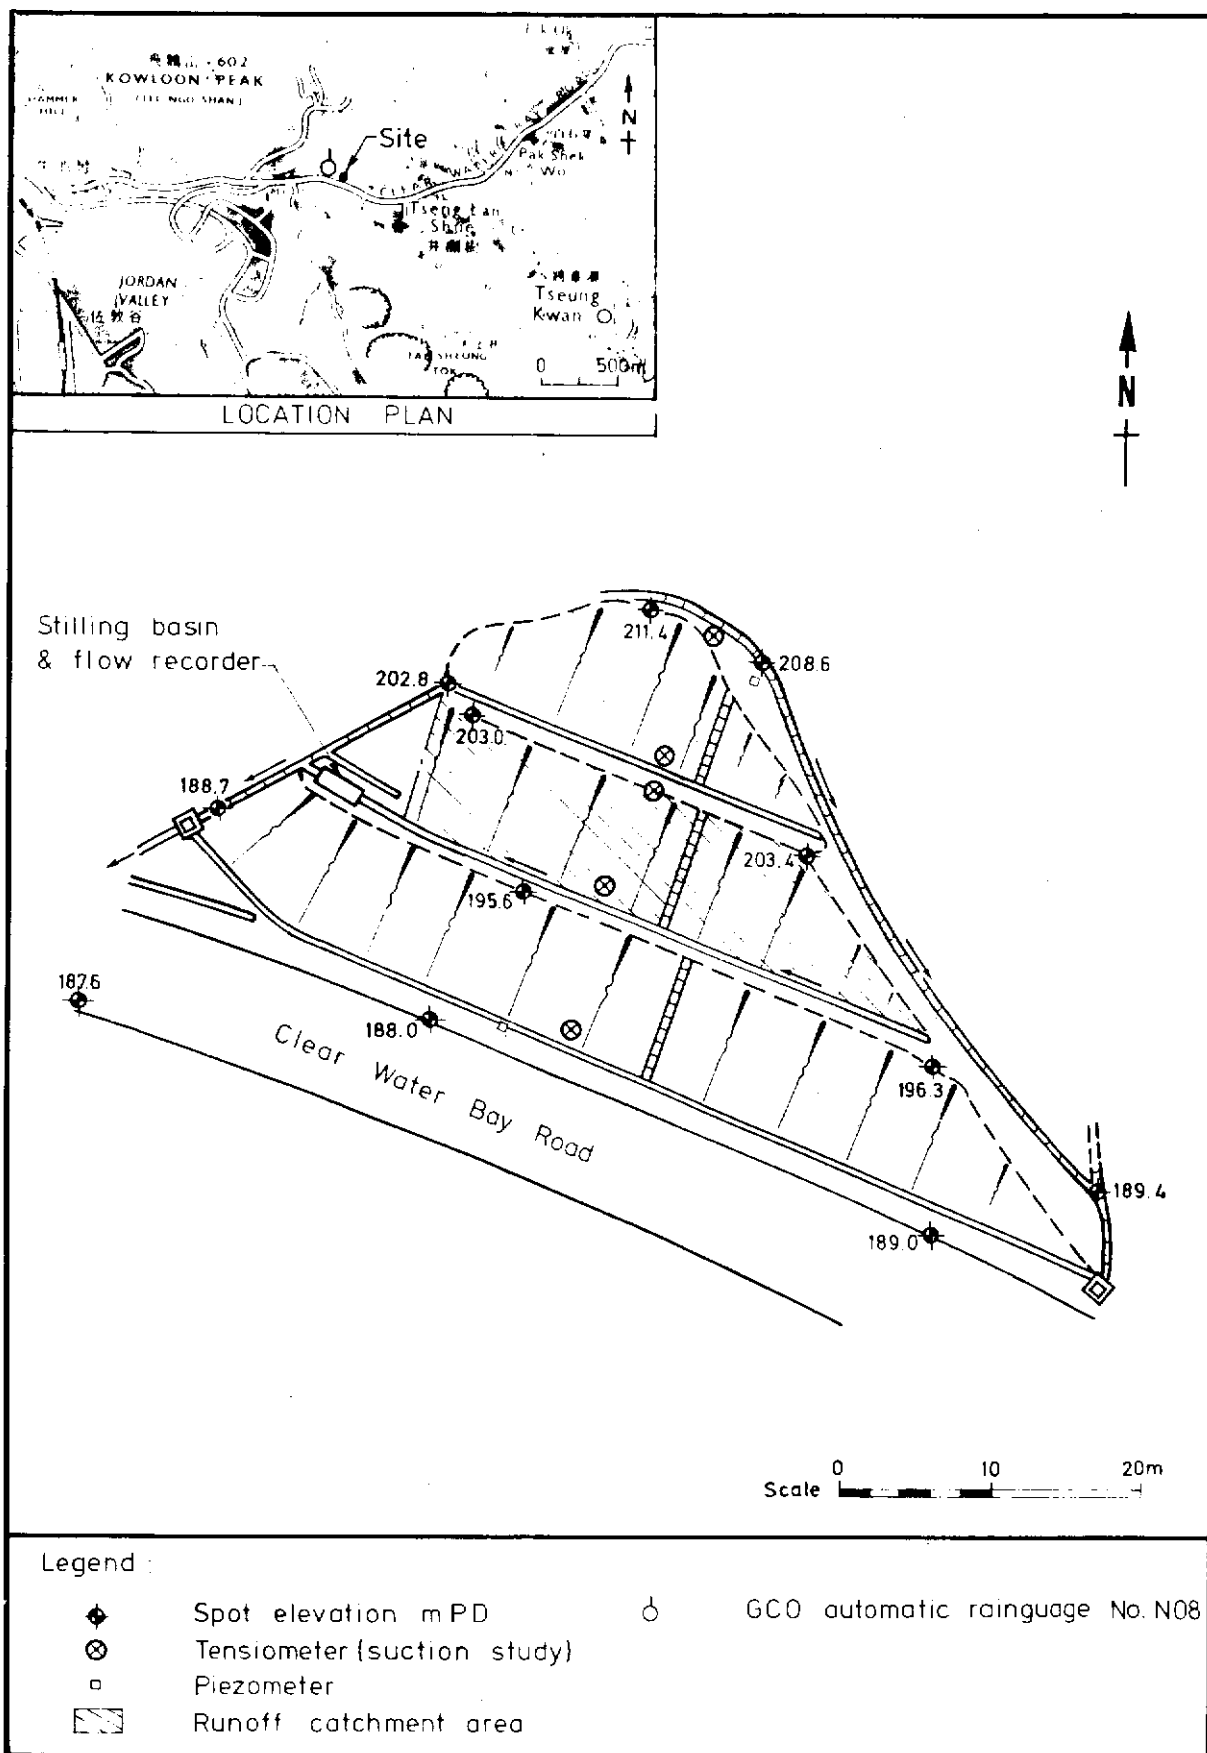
Site Plan for the Runoff Plot on Clear Water Bay Road Grassed Slope (CWB)
